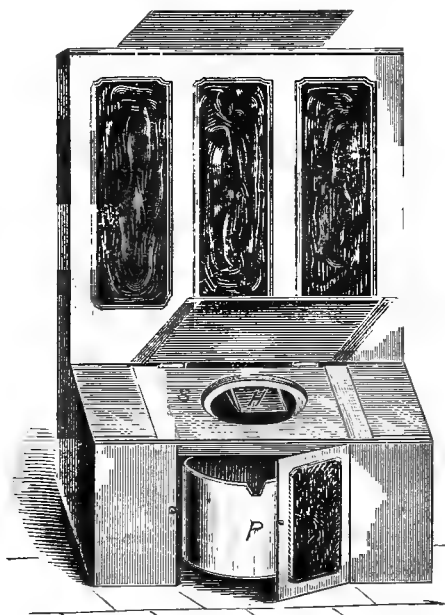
Heap's Dry-earth Closet. Elevation.
